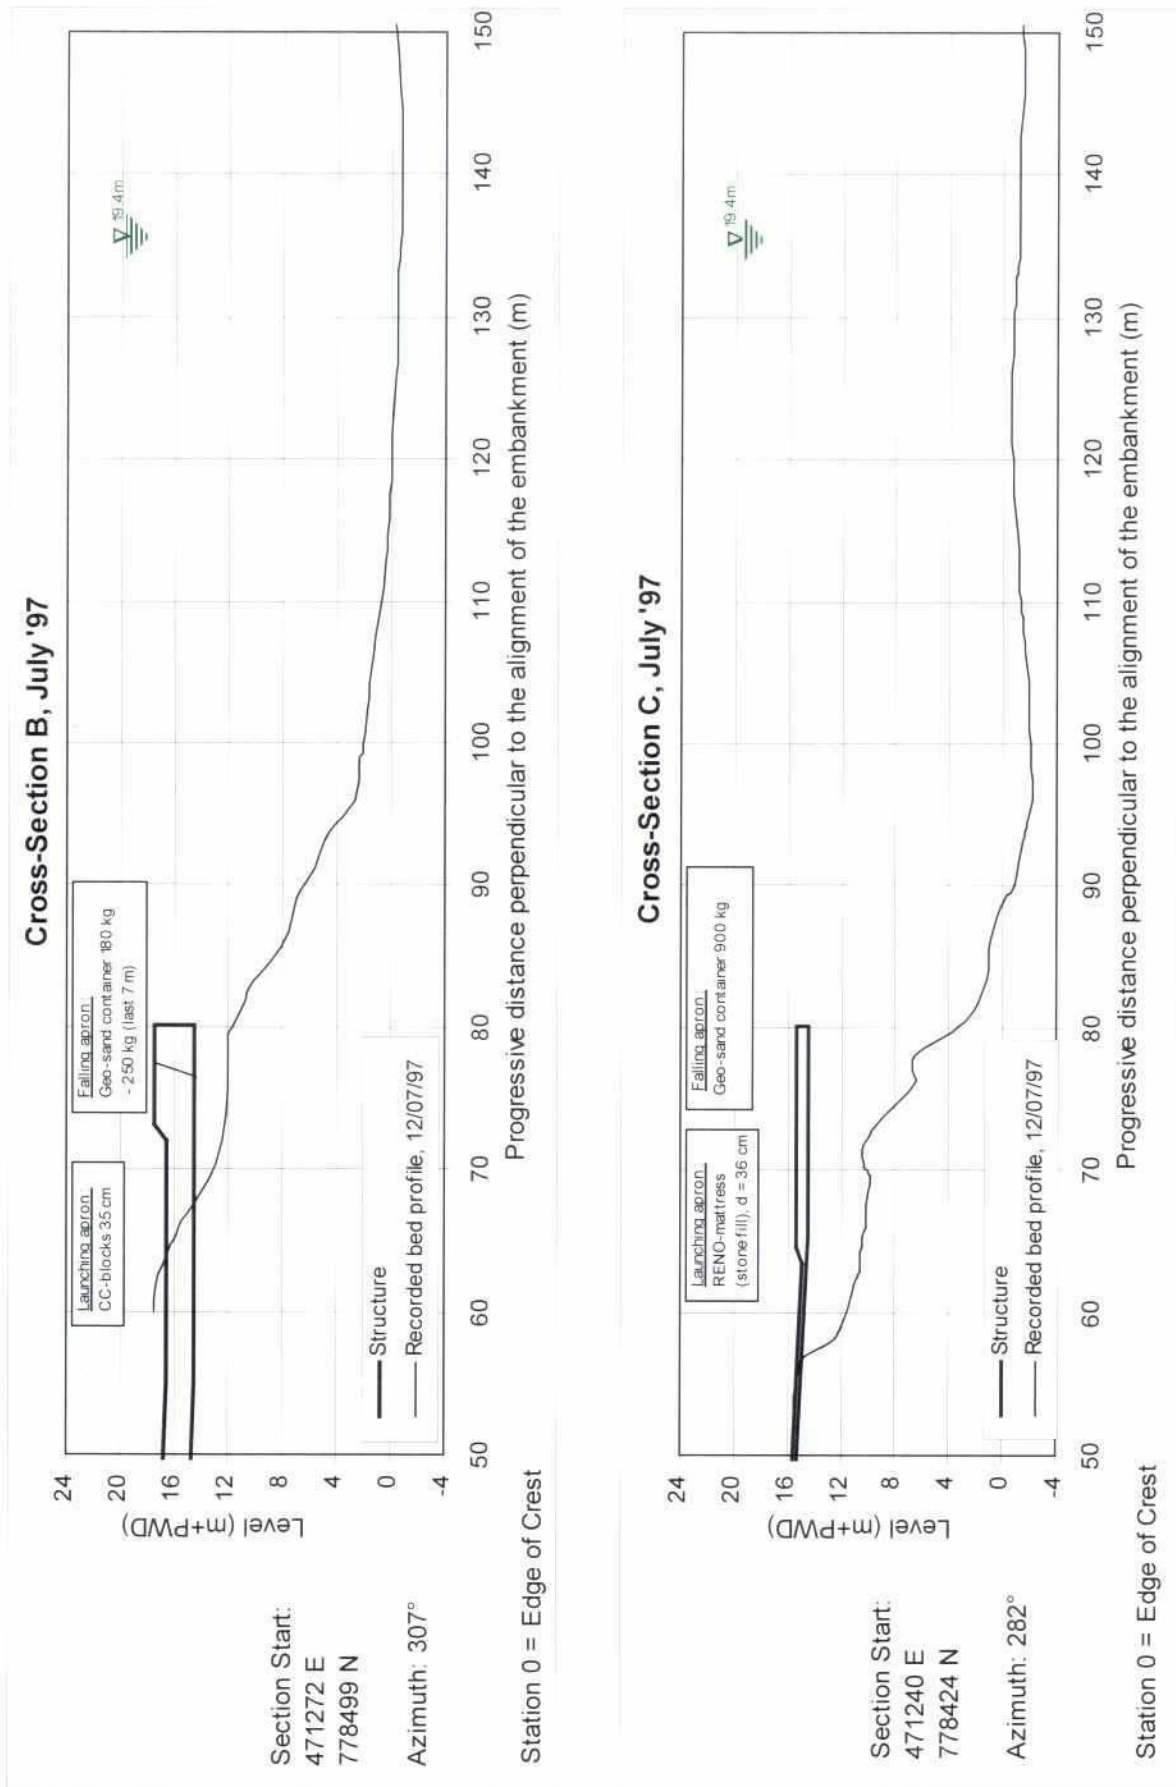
Steepest slope surveyed in Section B and C
